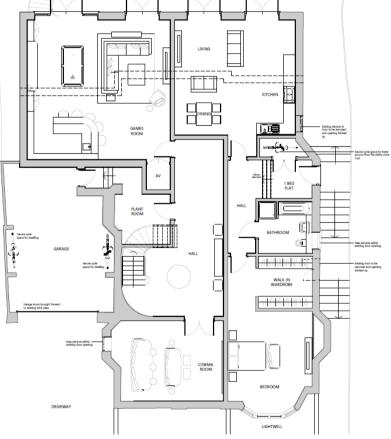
Proposed lower ground floor plan showing the residential ancillaries.
